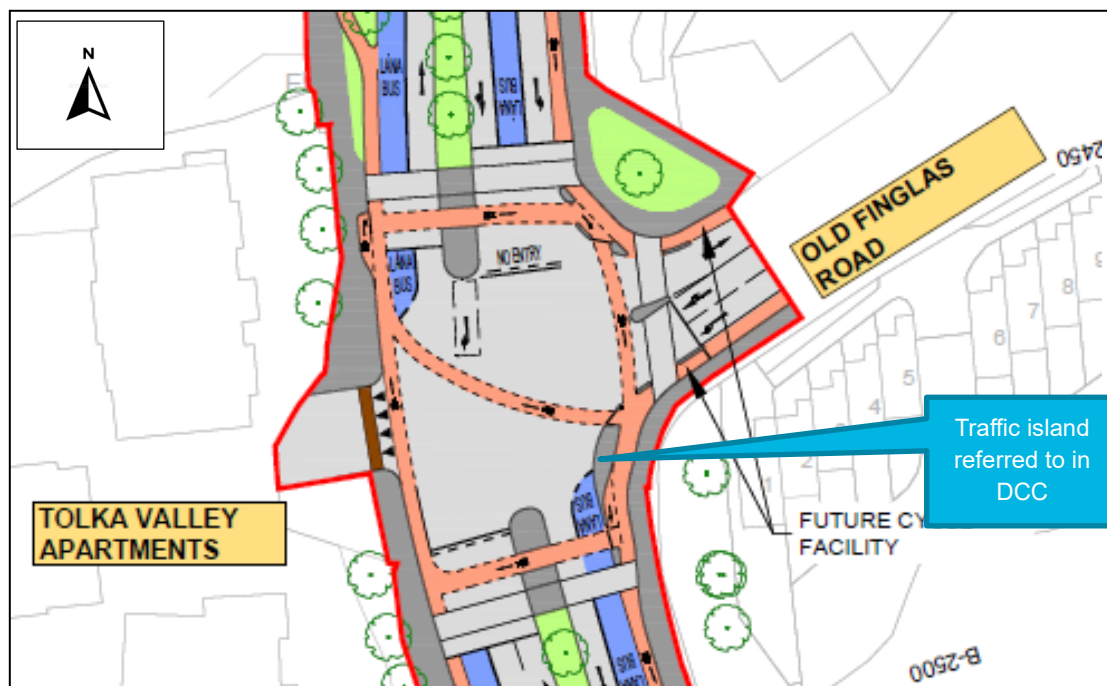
Extract from General Arrangement Drawing Sheet 32 at Old Finglas Road Junction
